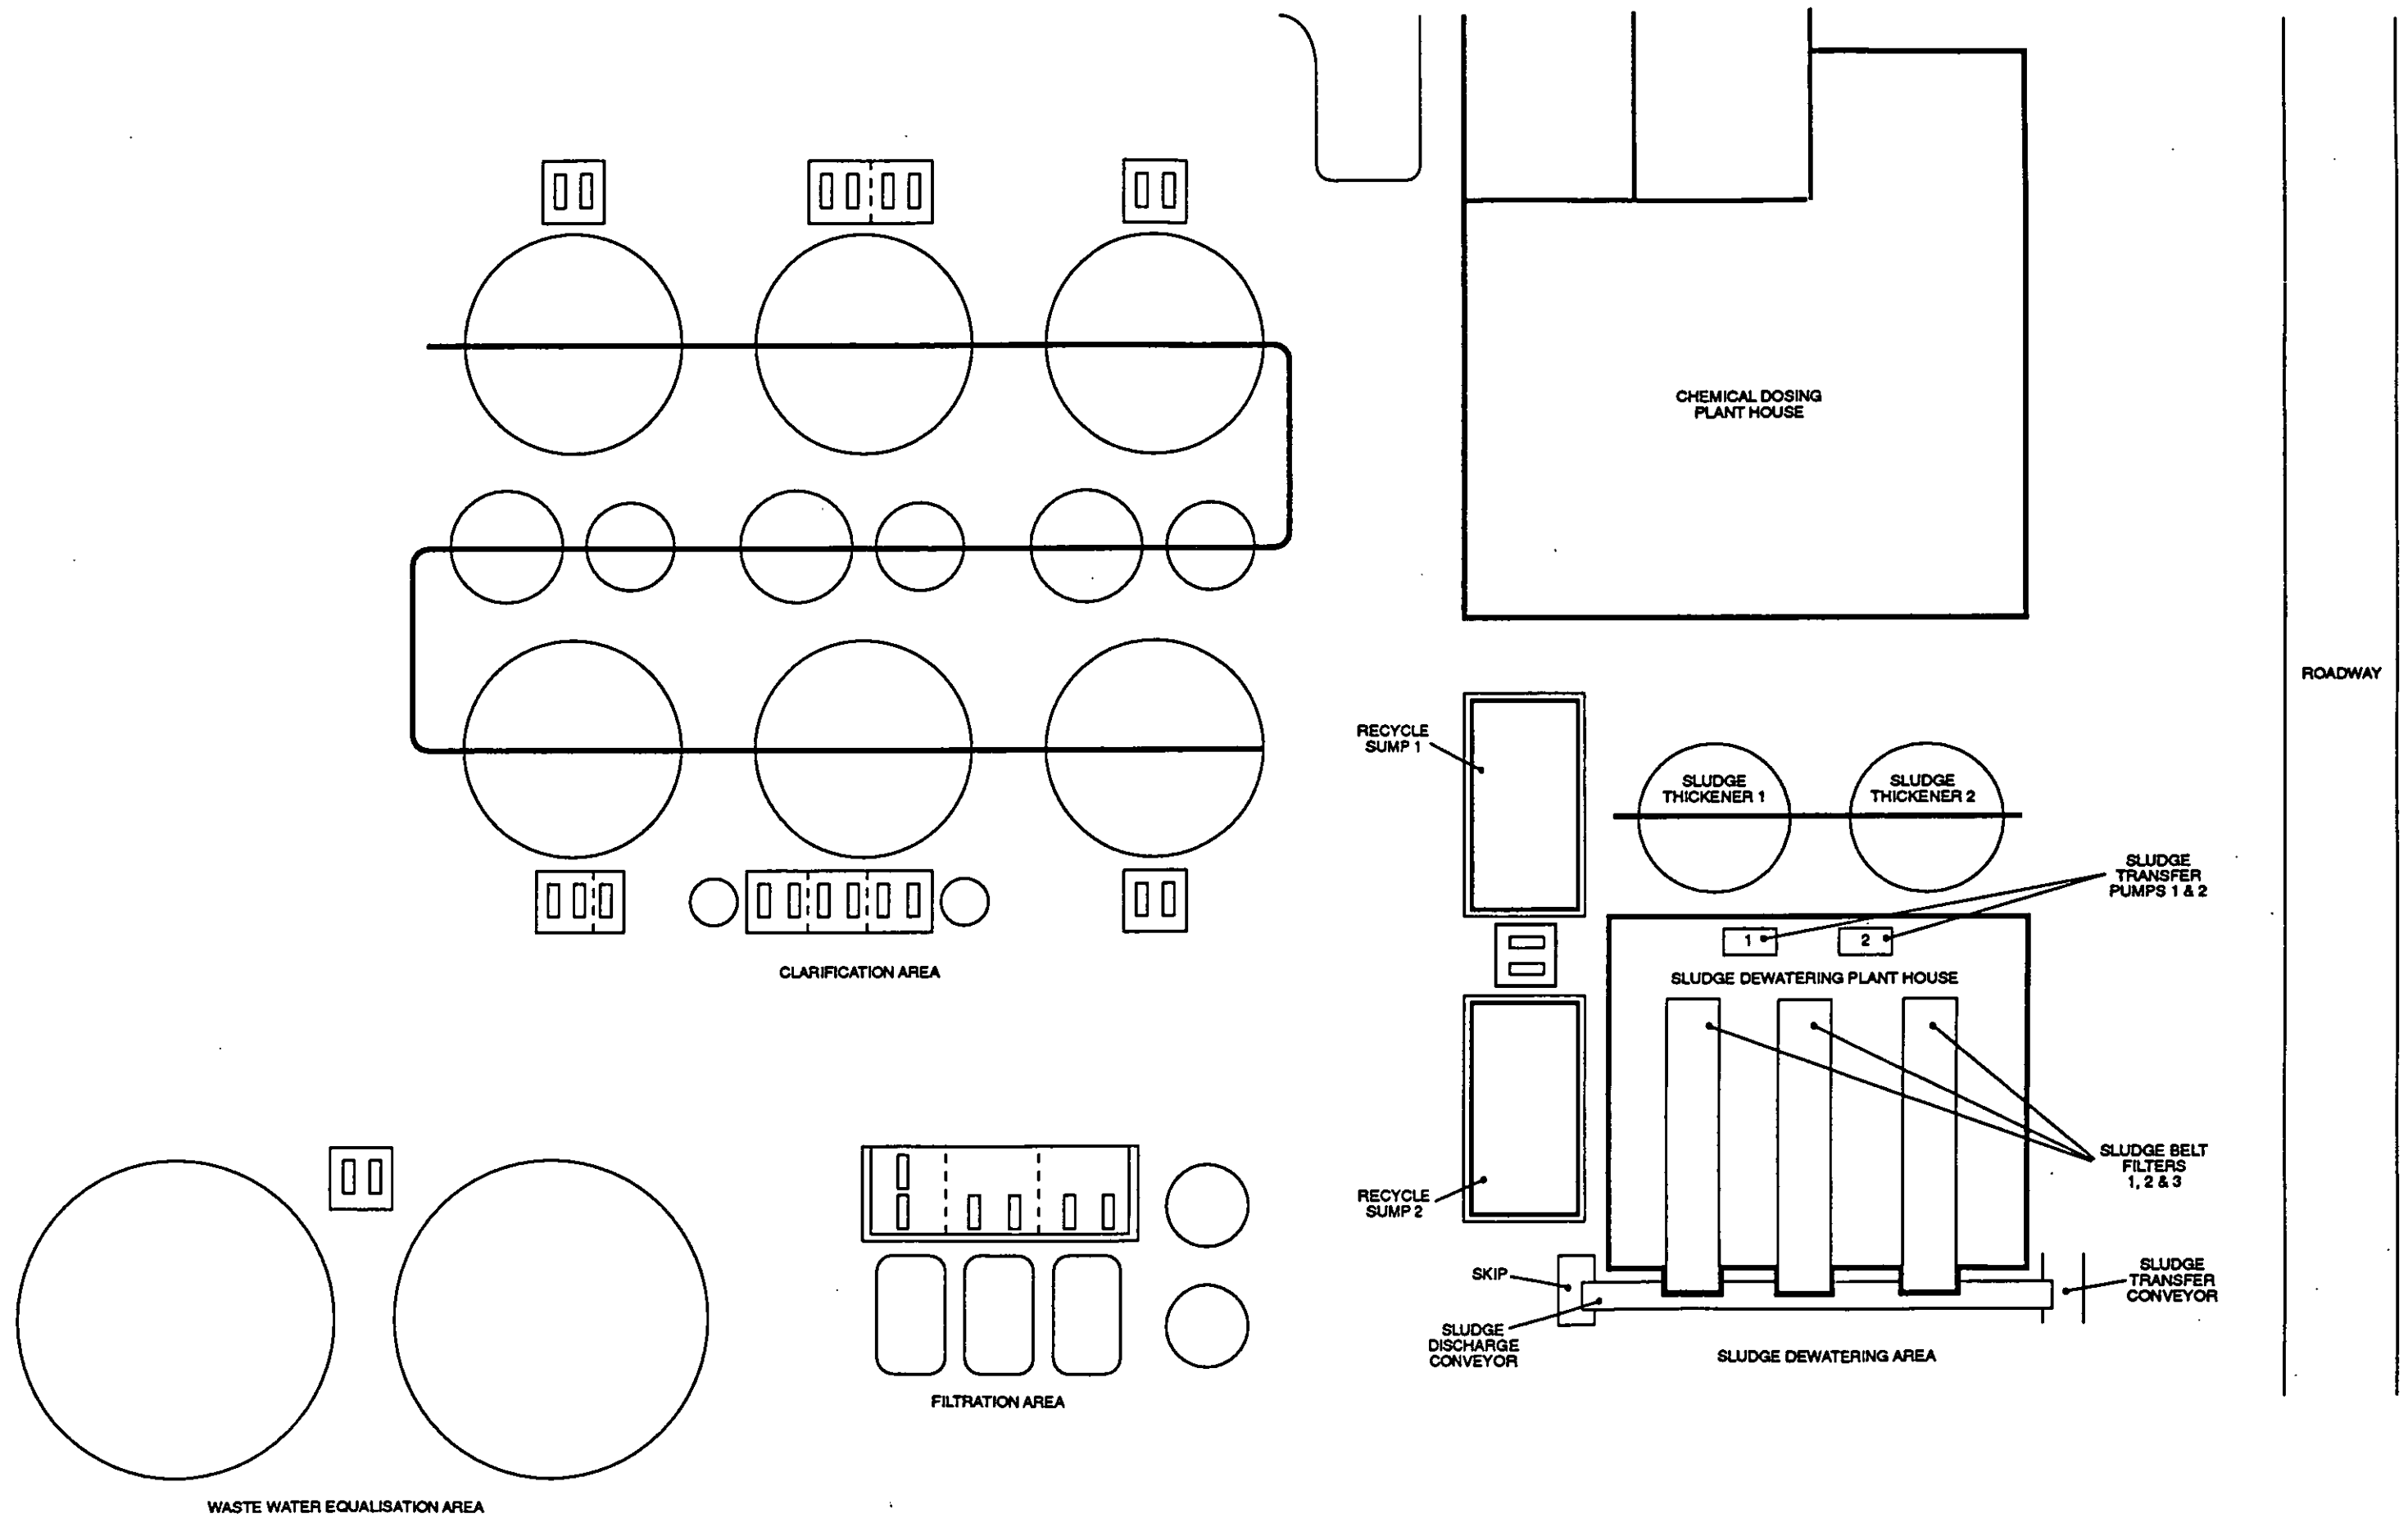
SLUDGE DEWATERING SYSTEM - PLANT LAYOUT
